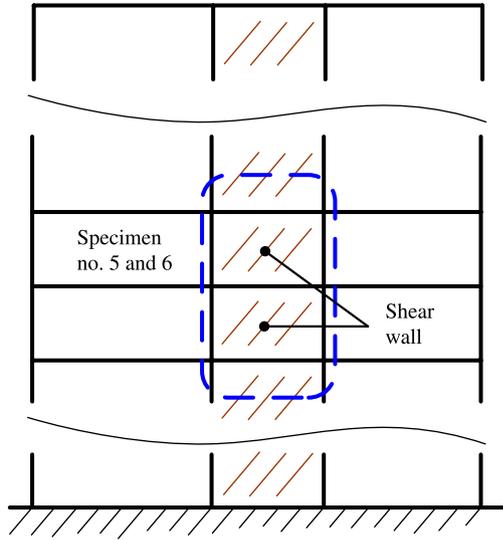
Relative location of Specimen Nos. 5 and 6 in a steel shear wall building.
